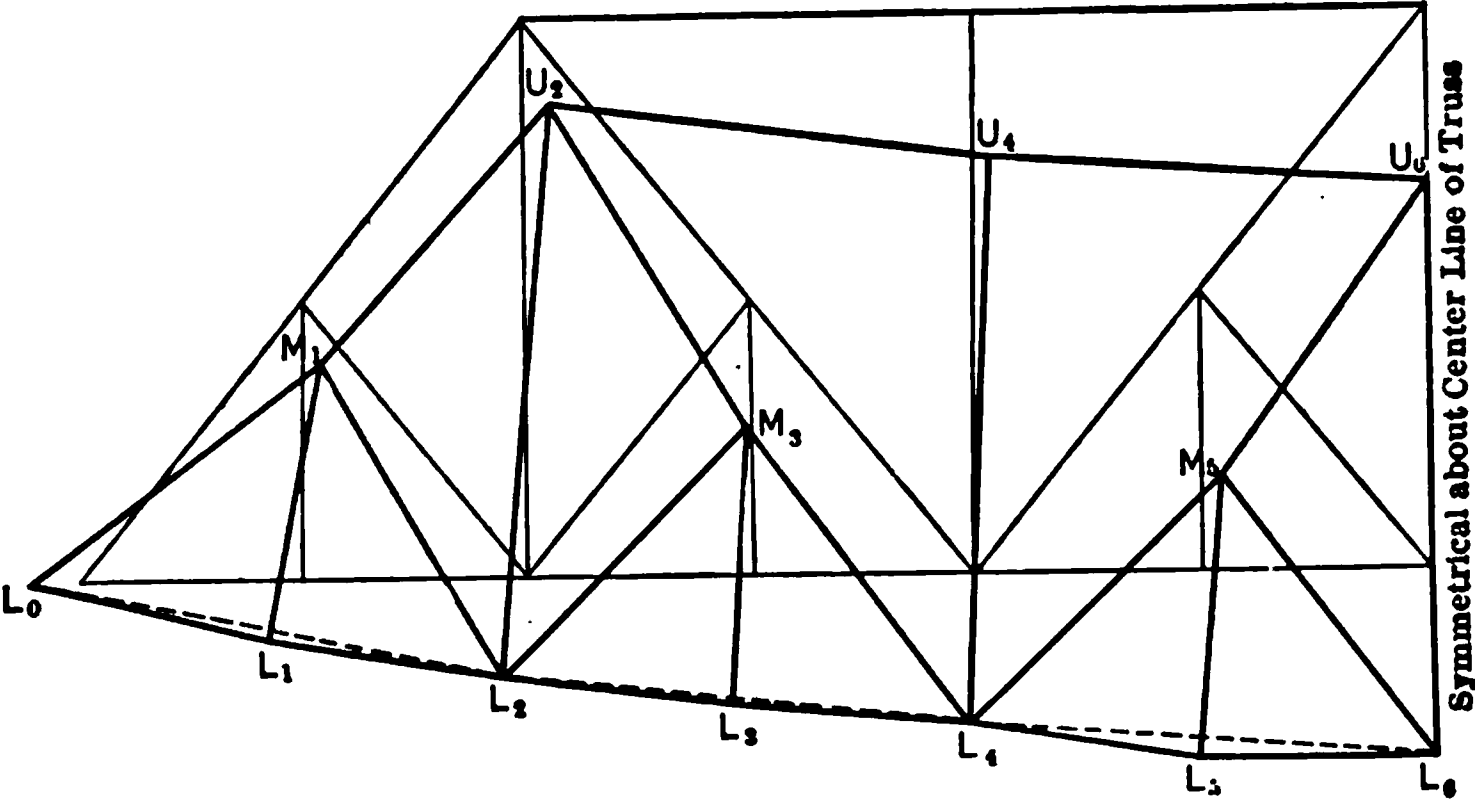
Deflection Diagram of a Subdivided Pratt Truss.
